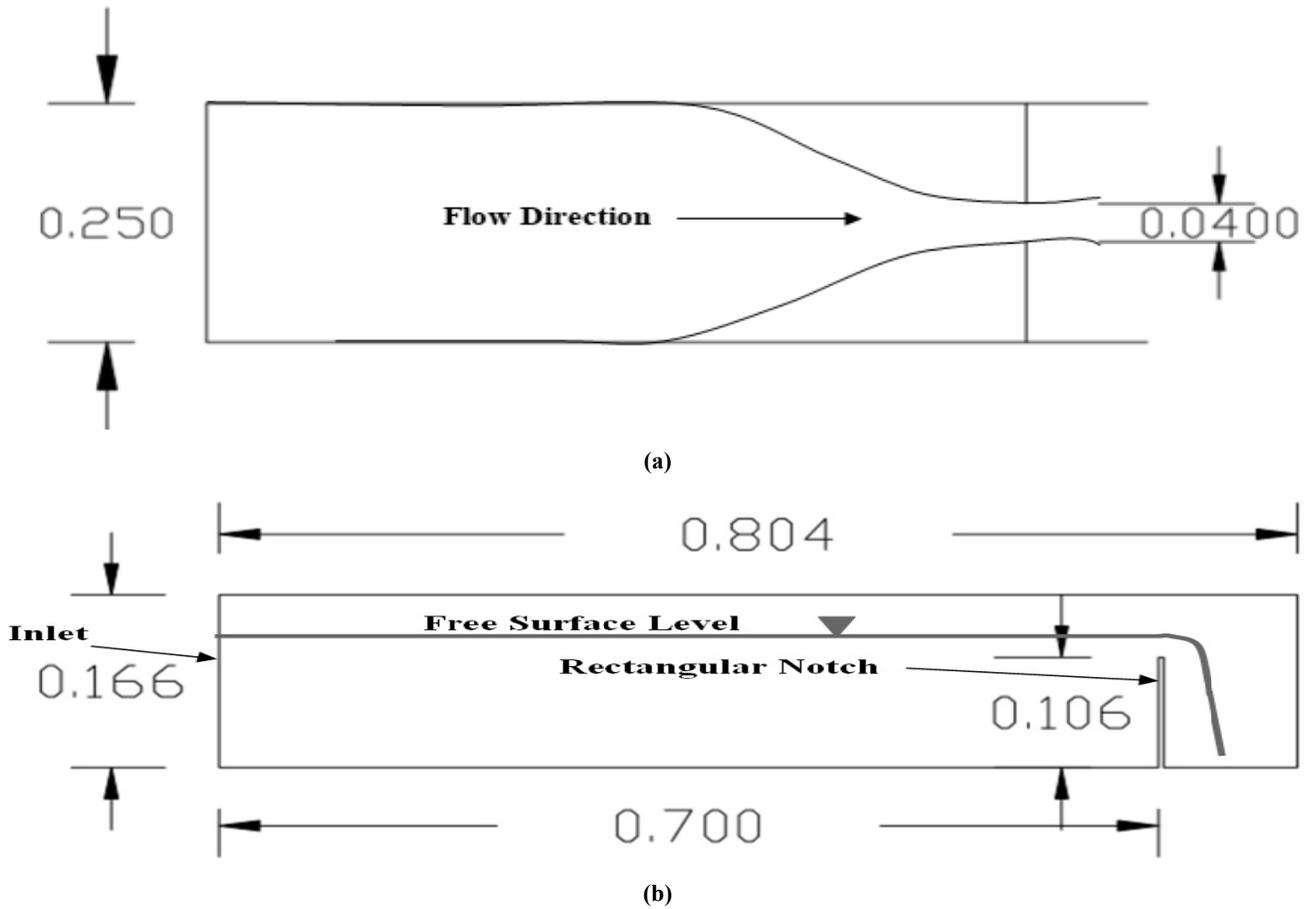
(a) Plan and (b) Longitudinal Section of Flume and Notch
